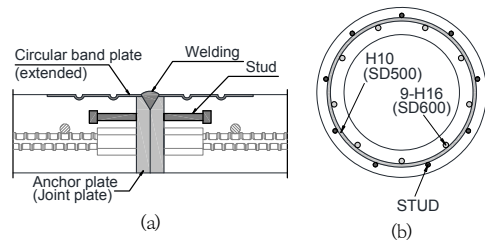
Diagrams of the reinforced joint of the spun RC pile[3] (a) Side view (b) Cross-section
